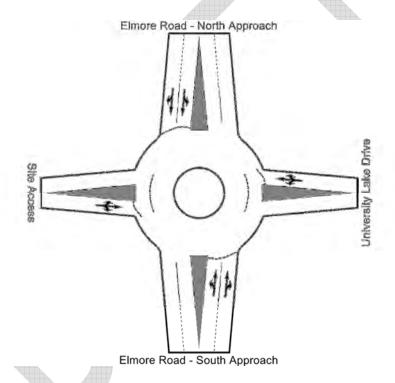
Elmore Road/University Lake Drive/Site Access Intersection Conceptual Roundabout
